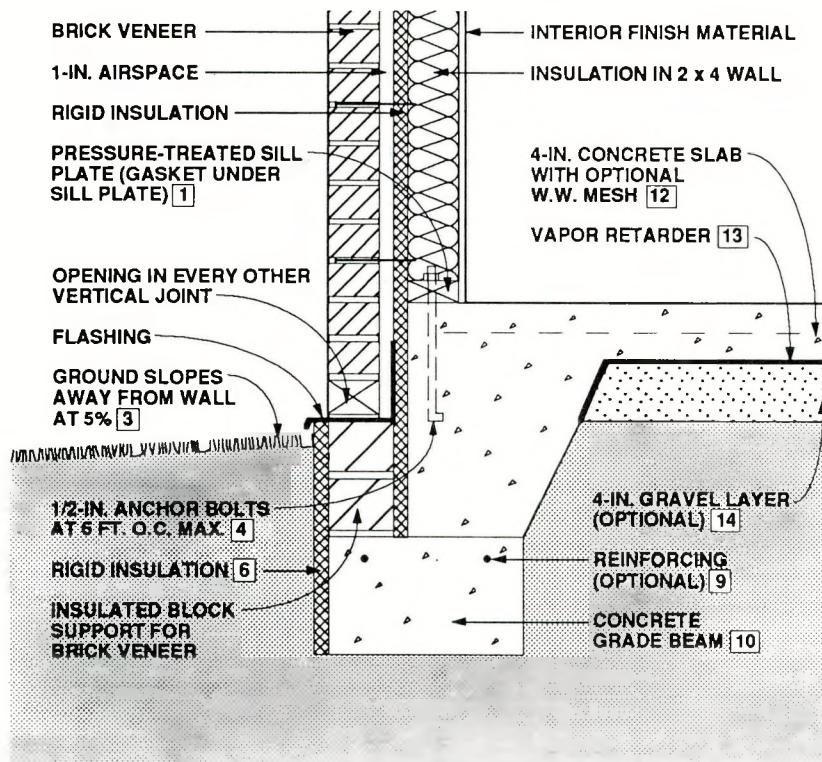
Slab-on-Grade with Brick Veneer (Exterior Insulation)
